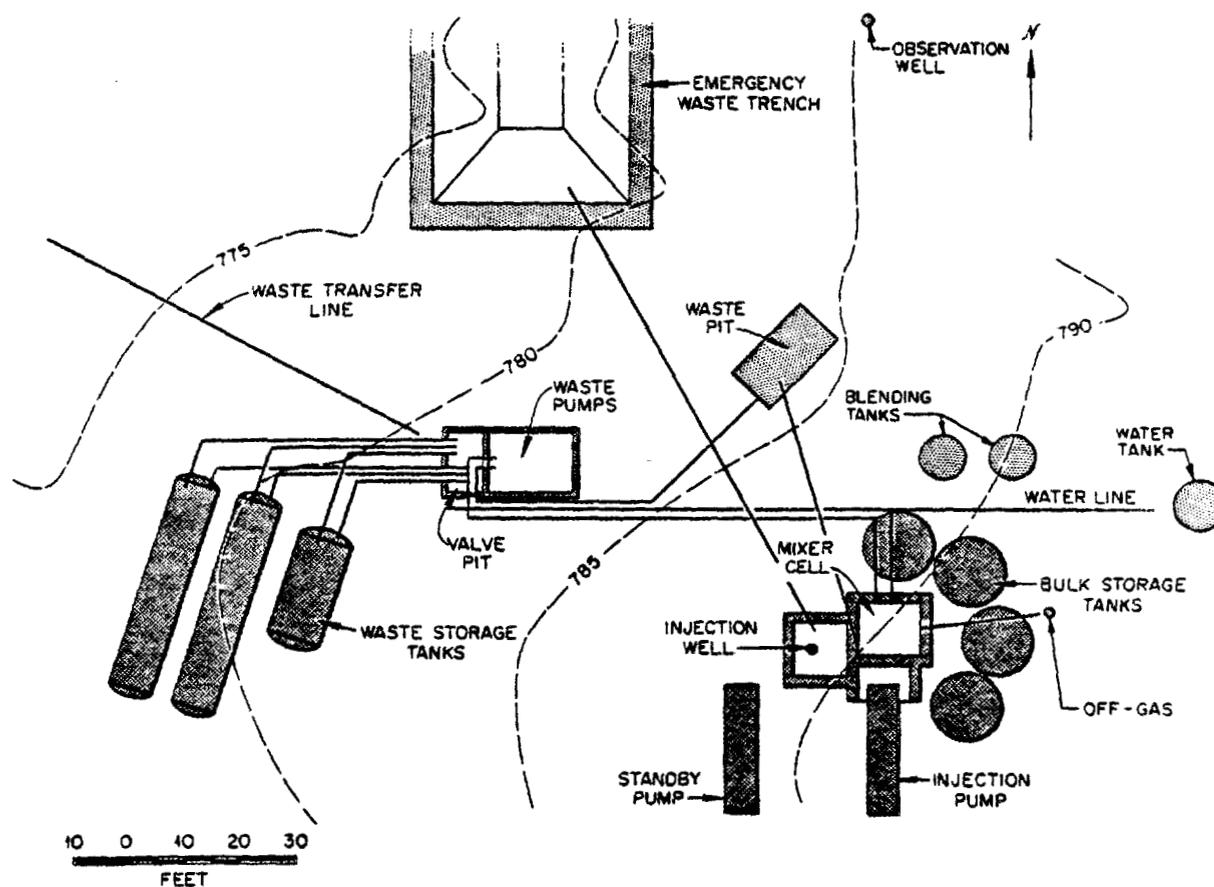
Layout of the Hydraulic Fracturing Plant.
